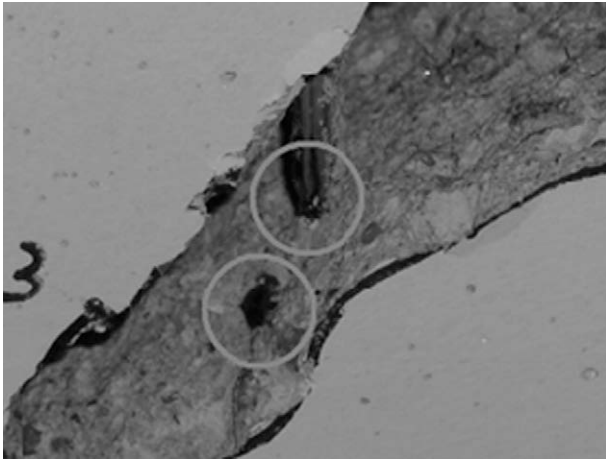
Failure of the stirrup closest of the loaded section (VL3 beam).
